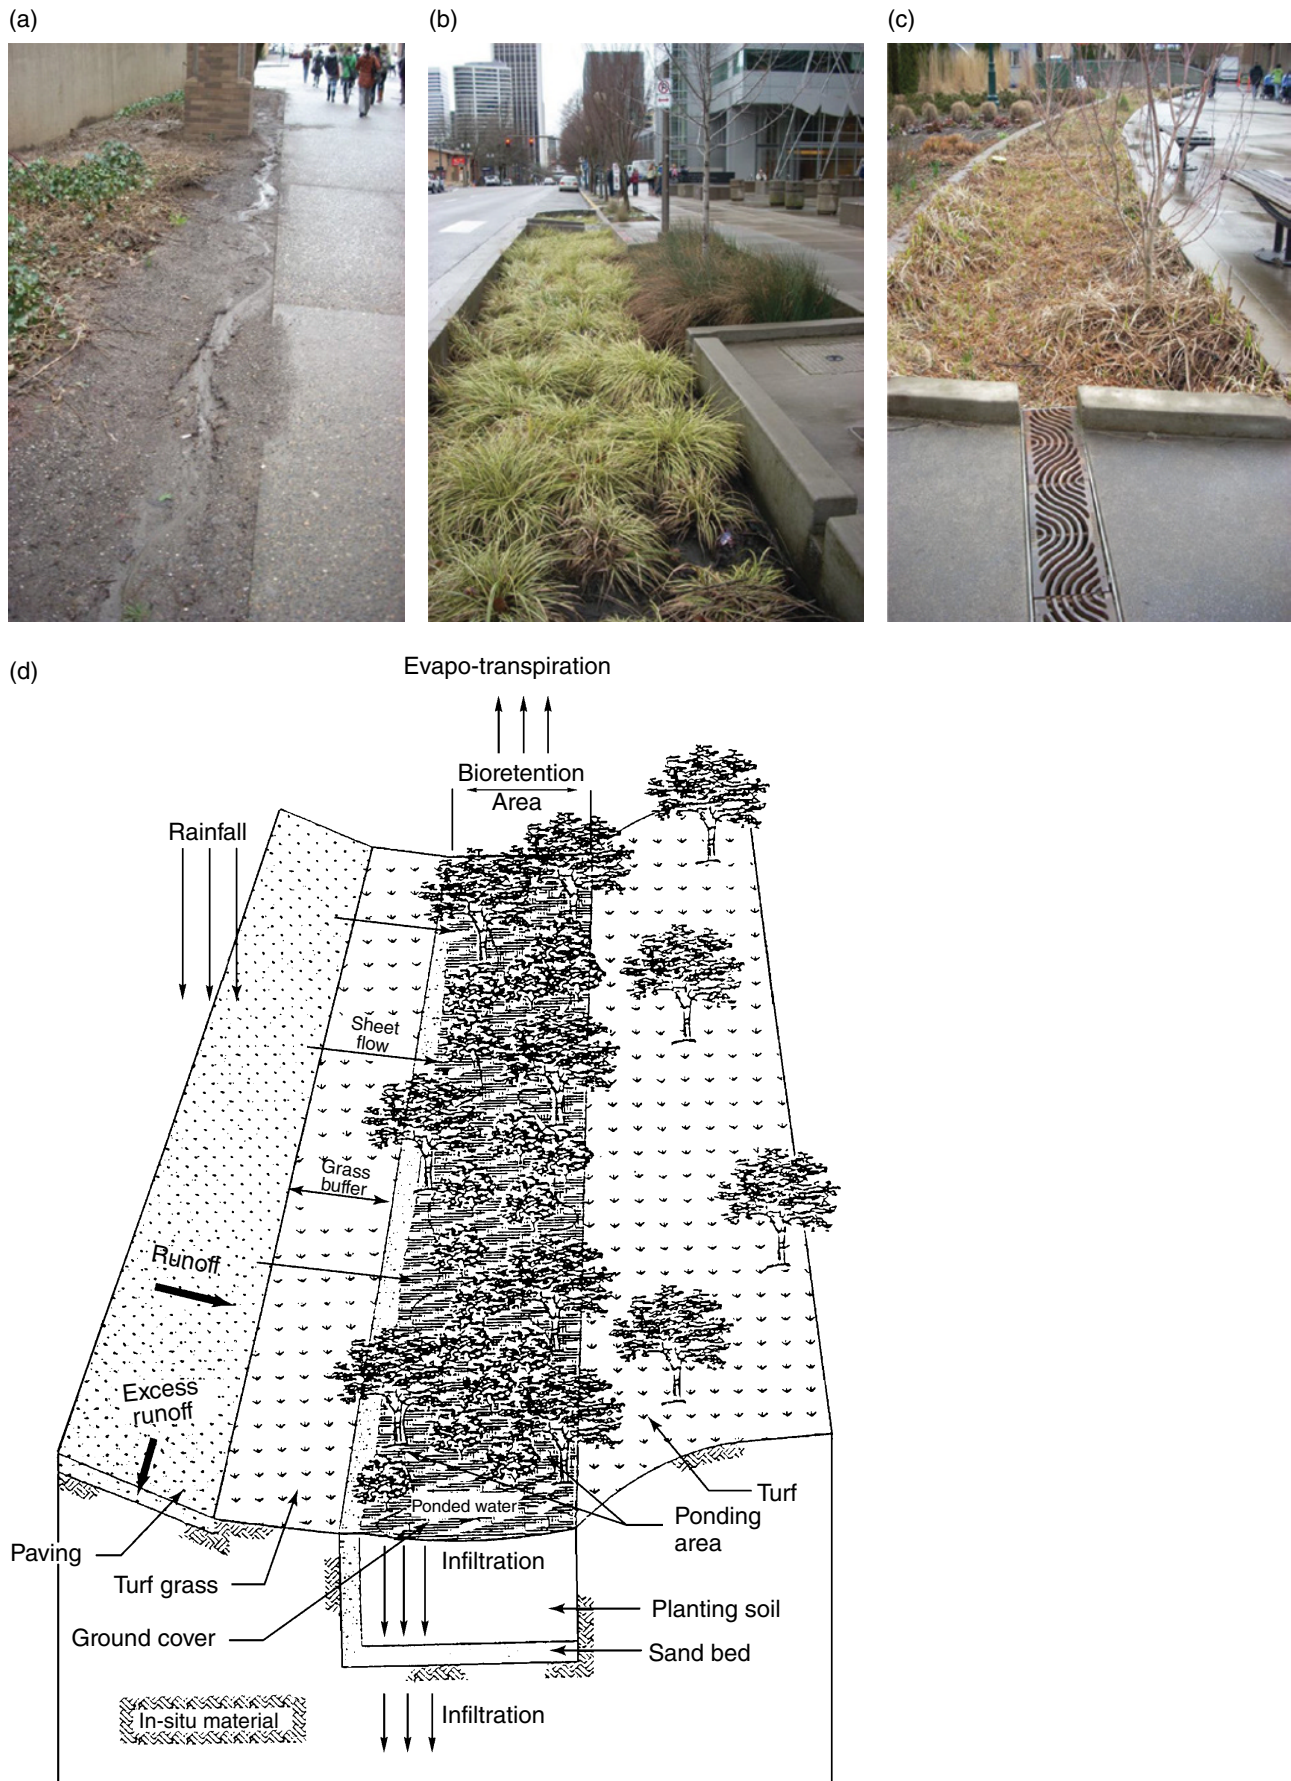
Illustrations of bioswales in Portland, Oregon. (a) Surface erosion and stormwater runoff with no bioswale treatment. (b) Street diversion of stormwater runoff into a bioswale. (c) Pavement diversion of stormwater runoff. Source: (a–c) Mark S. Ashton. (d) An example of a bioswale design. Source: Urban Water Group, Department of Civil and Environmental Engineering, University of Utah.
